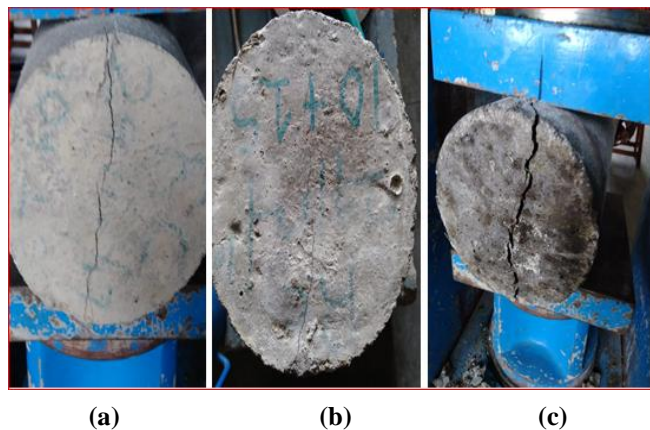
Failure of the concrete cylinders: (a) conventional concrete, (b) 5% rubber, (c) 10% rubber
